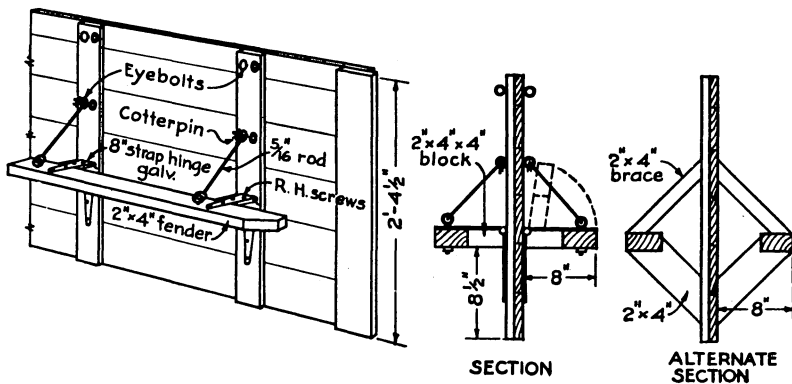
Guardrail to prevent sow from crushing pigs. (No. 2122)
